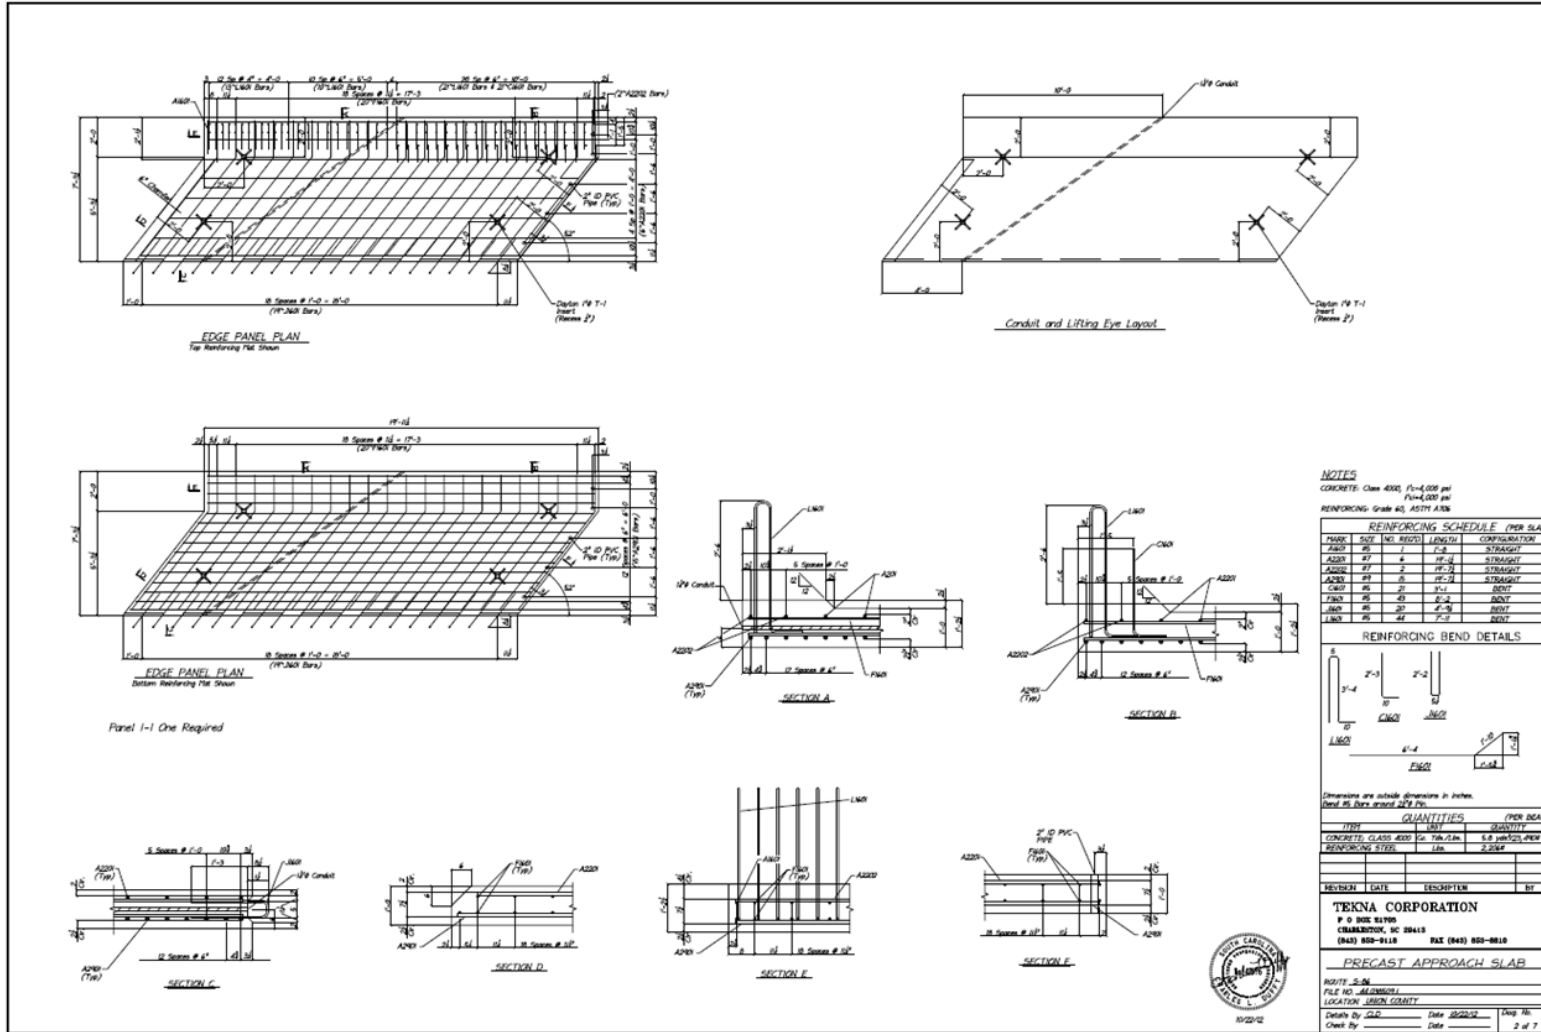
Bent One approach slab 'D' reinforcement schematic
